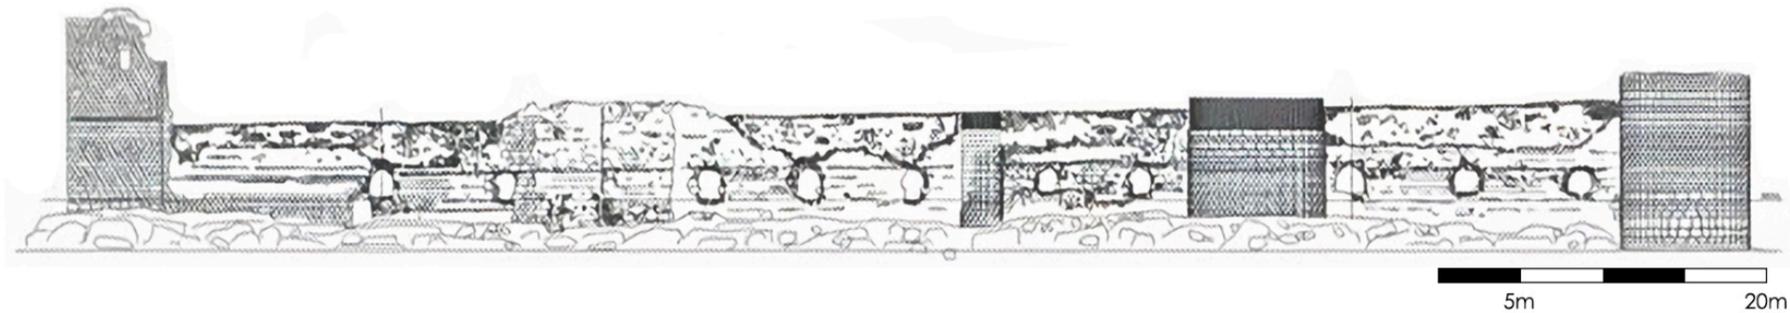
North elevation of the castle (Source: Miyar Mimarlık Mühendislik, 2020)
